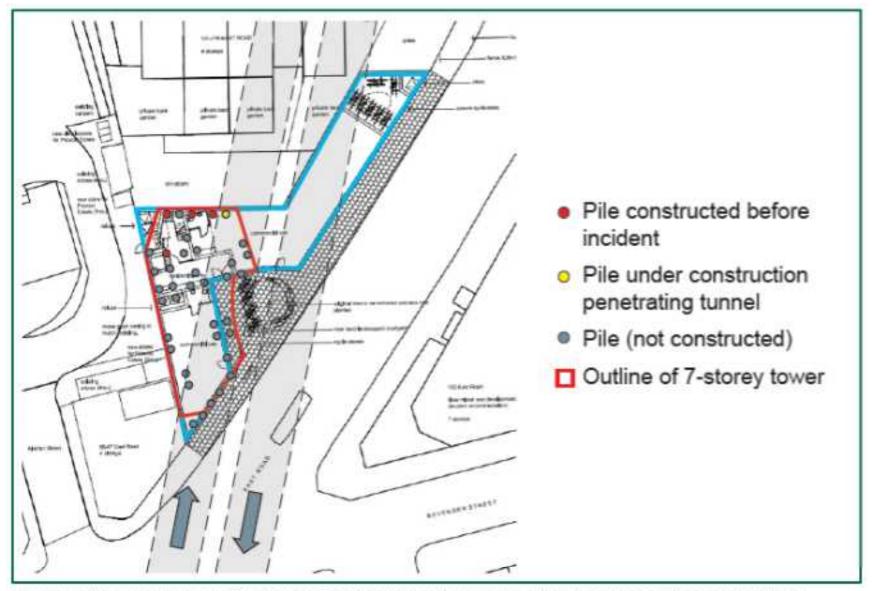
Extract from 2011 planning application enhanced to show location of piles and tunnels
